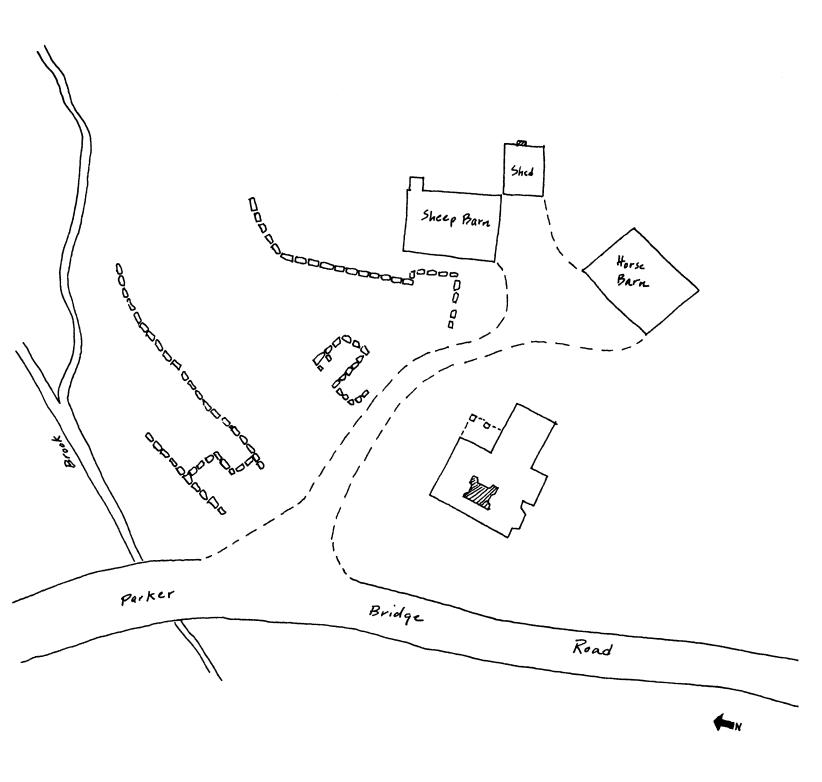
PLAN OF BUILDINGS ON PARKER-HUTCHINSON FARM, SHOWING FOUNDATIONS OF FORMER OUTBUILDINGS
